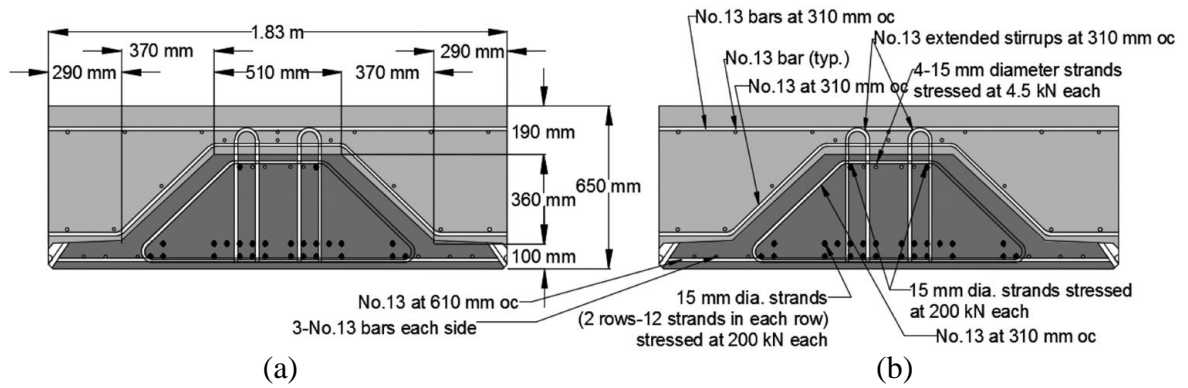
(a) Typical composite cross-section and (b) typical reinforcing details [50]
